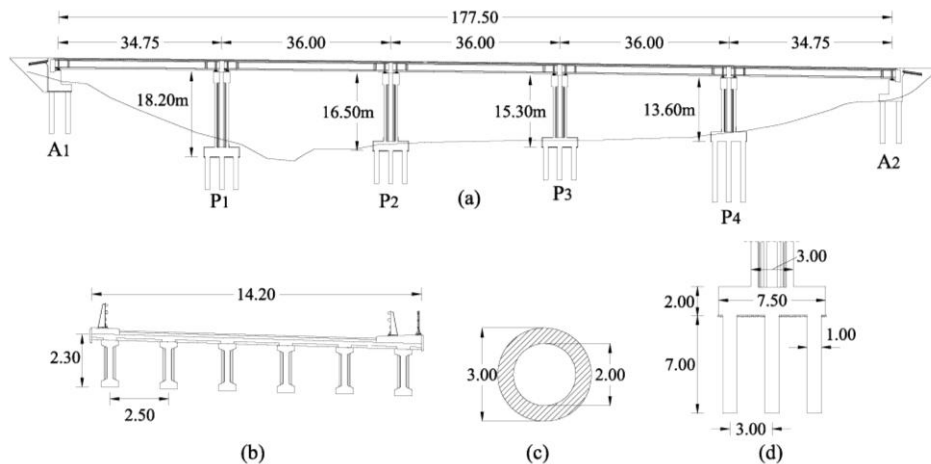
Longitudinal section of the “reference” precast I-beam bridge, (b) The cross-section of the deck at the mid-span and (c) The cross section of the pier and (d) longitudinal section of the deep foundation
